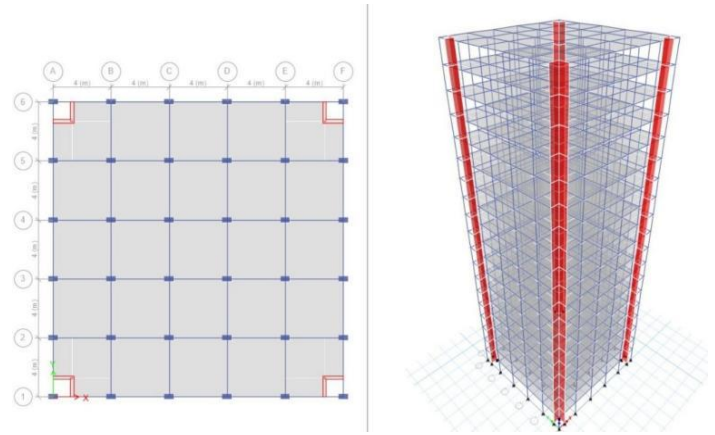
Diaphragm having openings at the corners with re-entrant corners having shear walls
